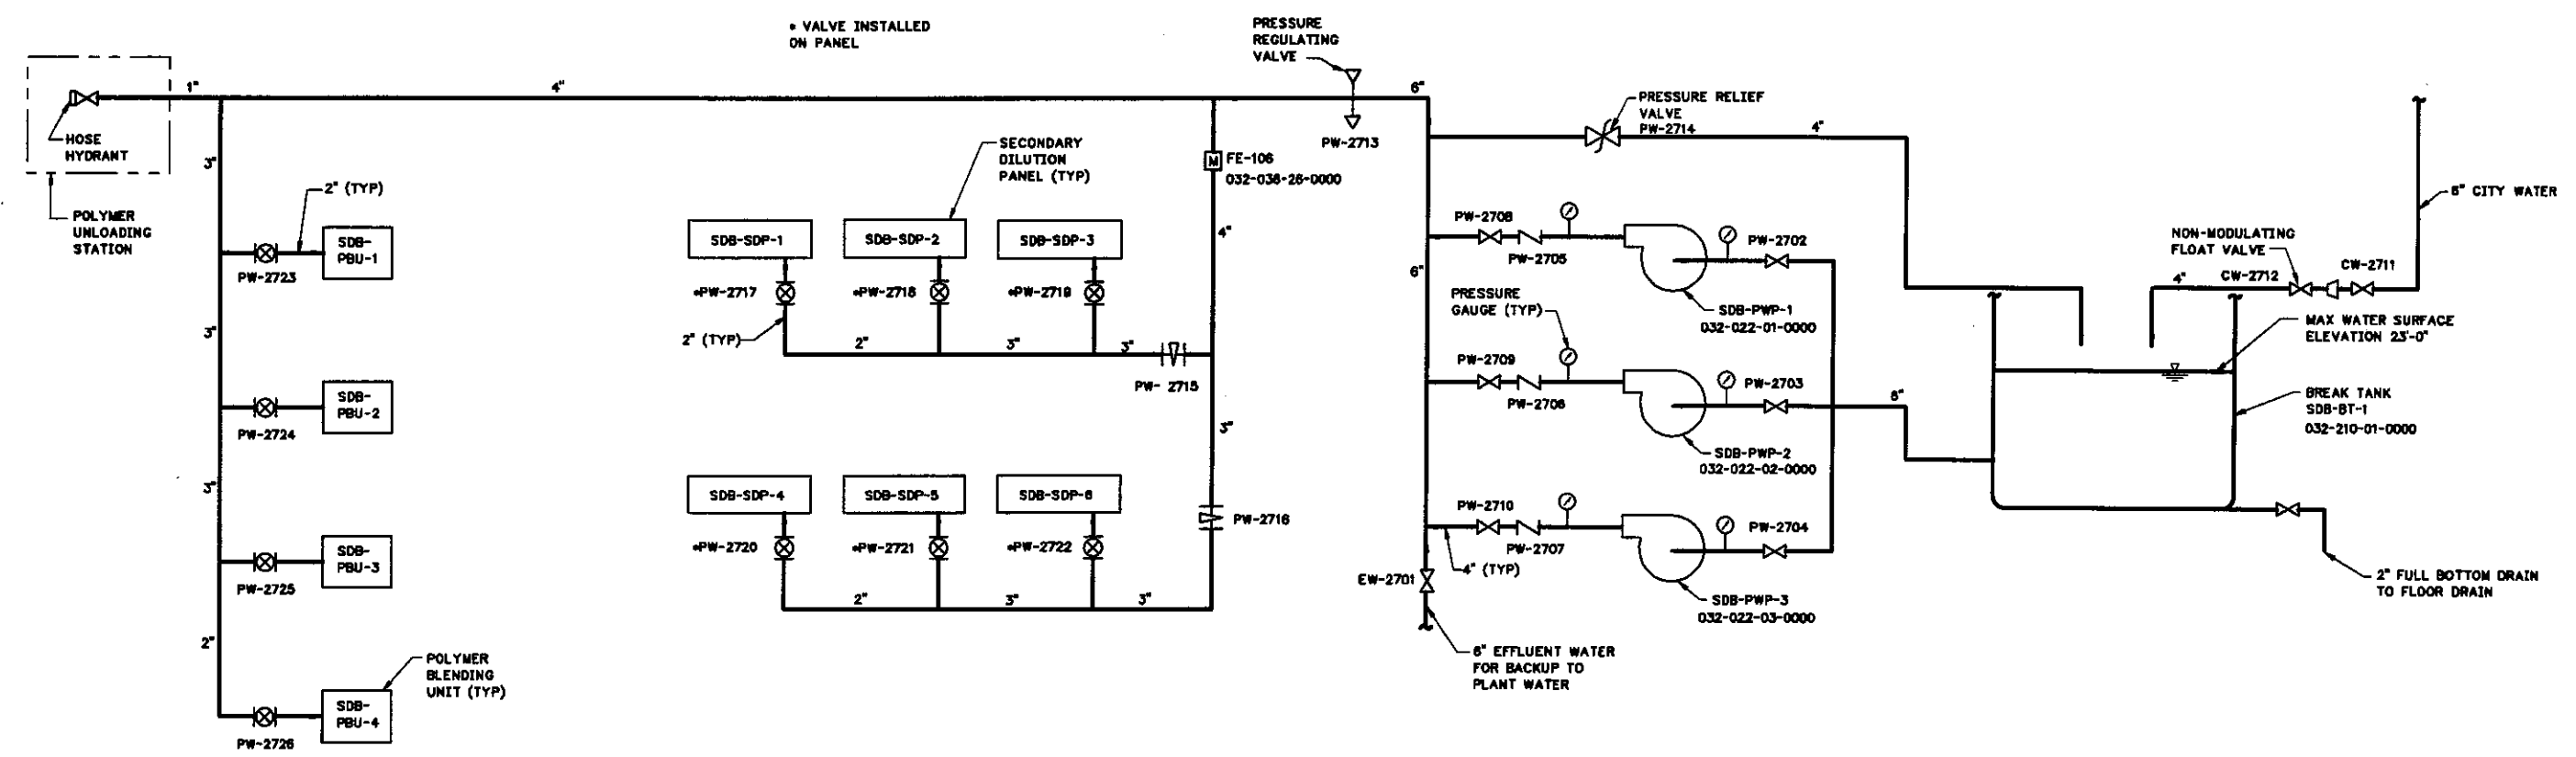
FIGURE III-SD-SDB-5 SLUDGE DEWATERING BUILDING-WEST PLANT WATER DIAGRAM
